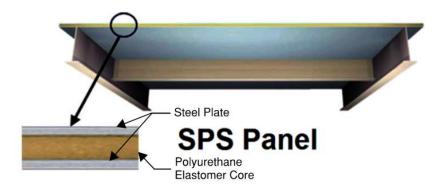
SPS panels for the ramp-way, stair, and elevator landings
